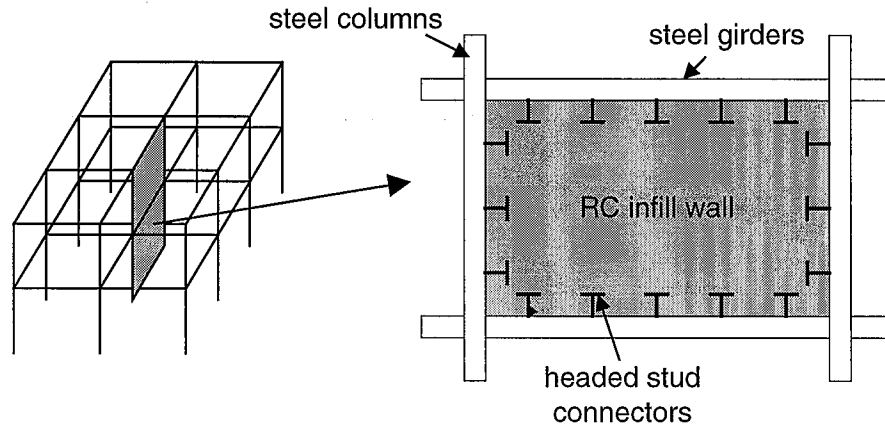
The Composite Steel Frame-RC Infill Wall System
